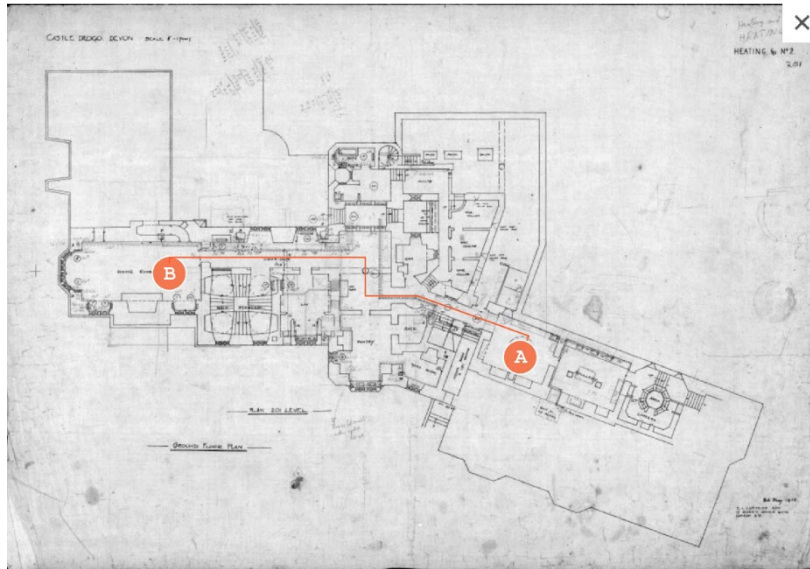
Ground Floor Plan with the path from the kitchen to the dining room (E.L. Lutyens 1916, with annotations from the author)
